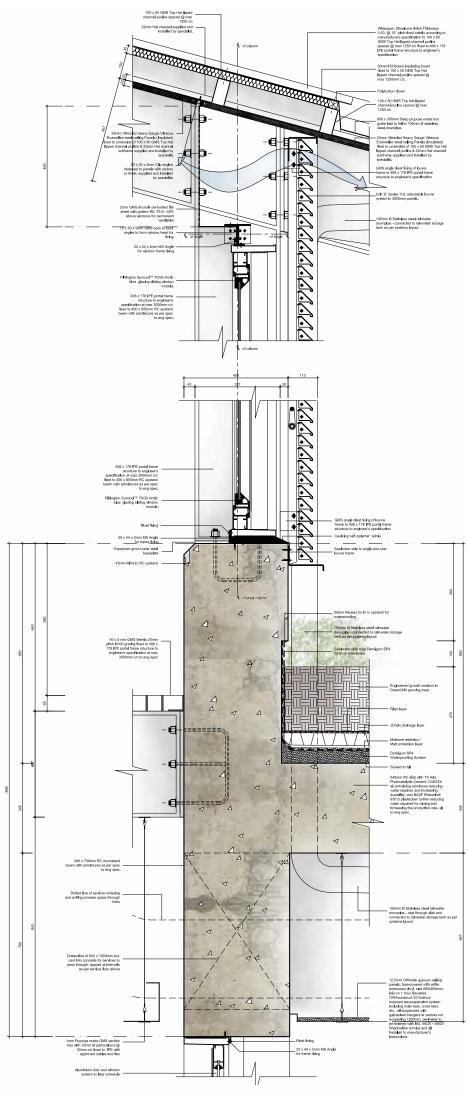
Detail 03 - 04 -Portal Frame / Roof Detail (By Author).
